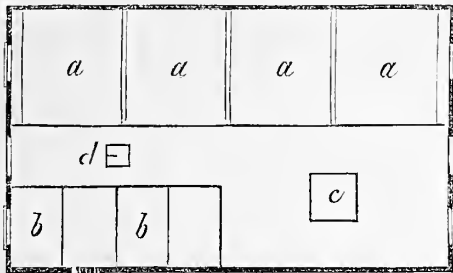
CIDER HOUSE—UPPER FLOOR.
